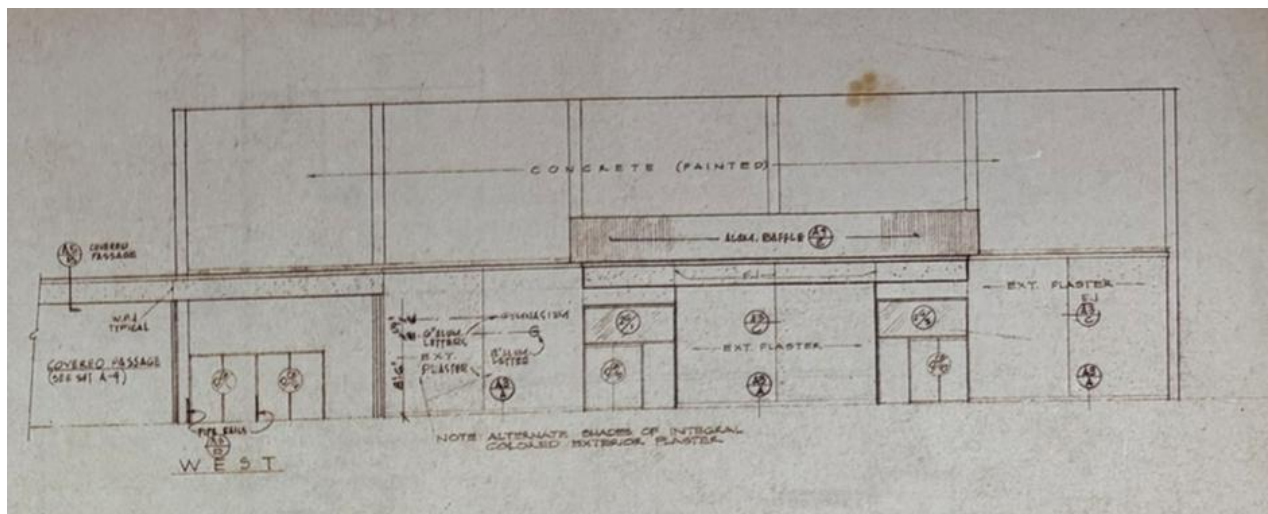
1967 drawing of Gymnasium (G2), west elevation (LATTC Facilities 2025)
